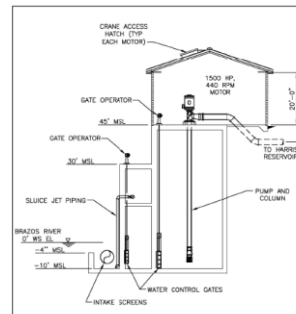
Harris Reservoir New Pump Station Concept Cross-Section Looking Upstream
